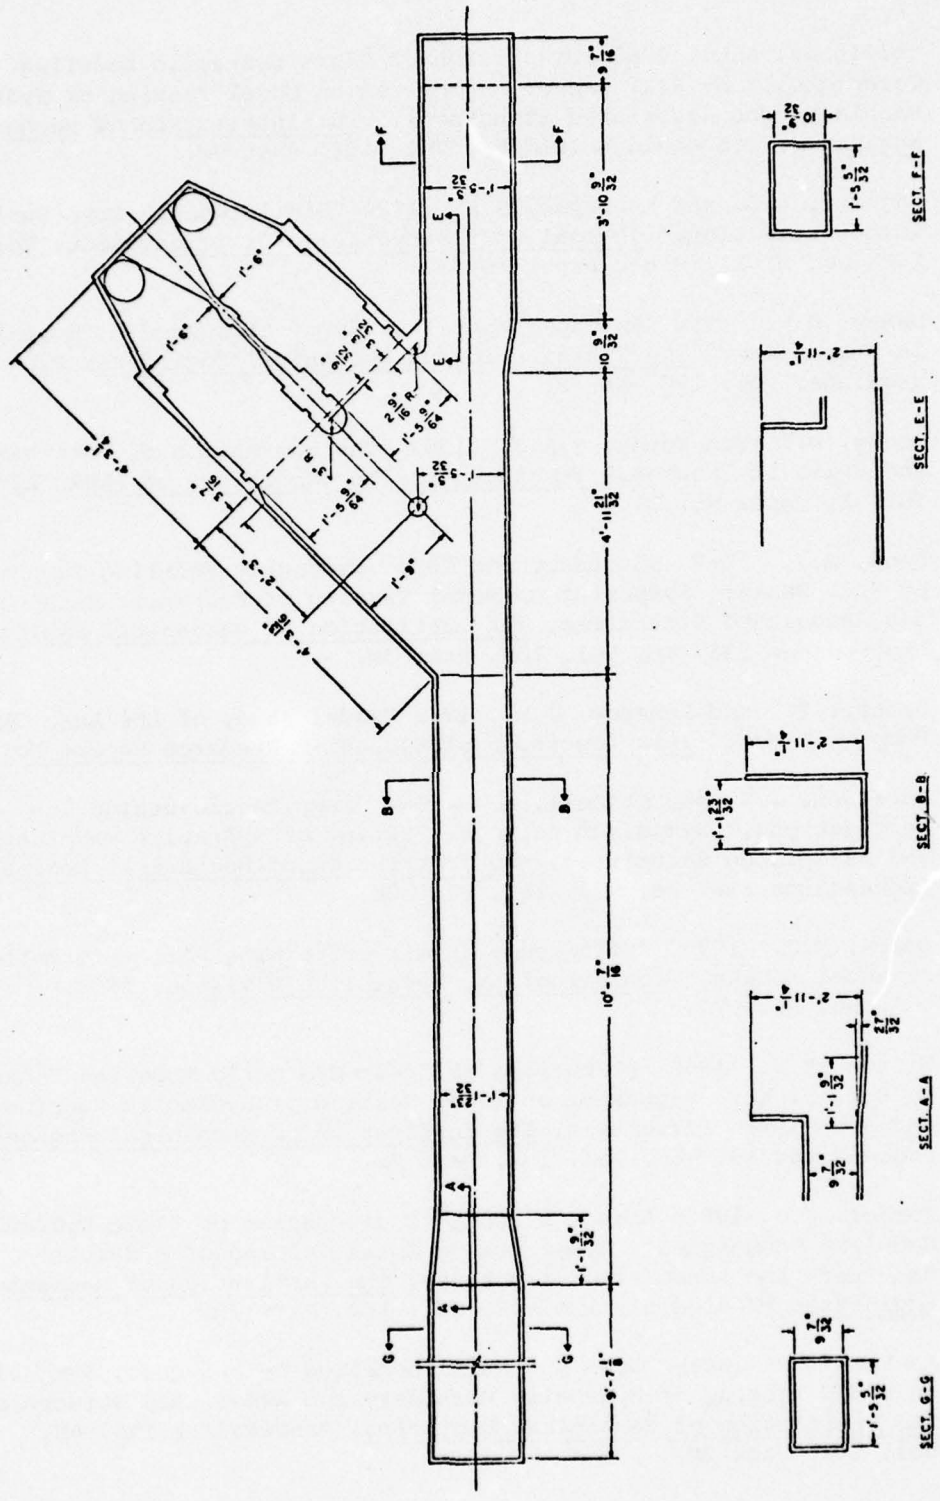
General plan view and channel sections of the Clinton First Avenue Pump Station Model
